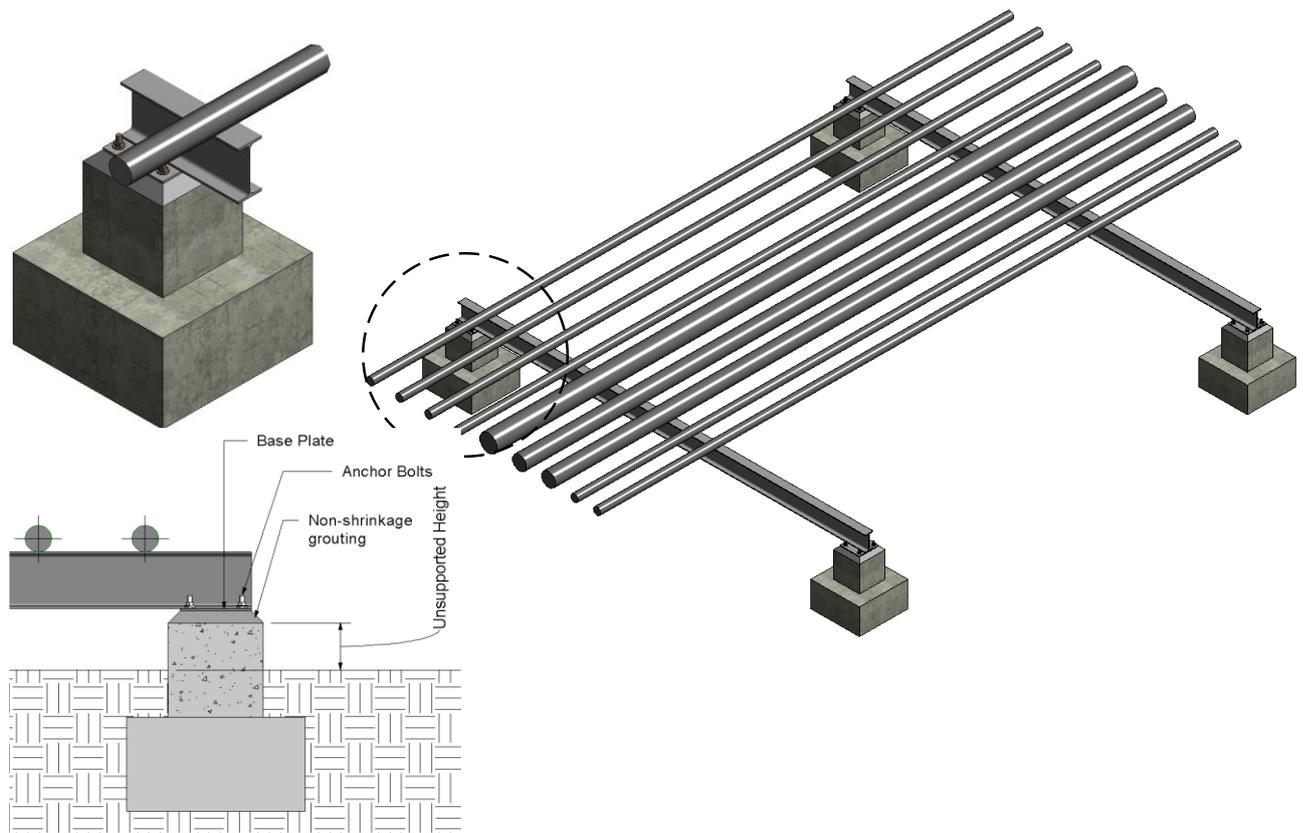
Pedestal used in a pipe supporting structure.
